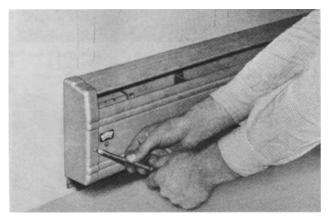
Tightening cover screws. (Courtesy Vulcan Radiator Co.)
